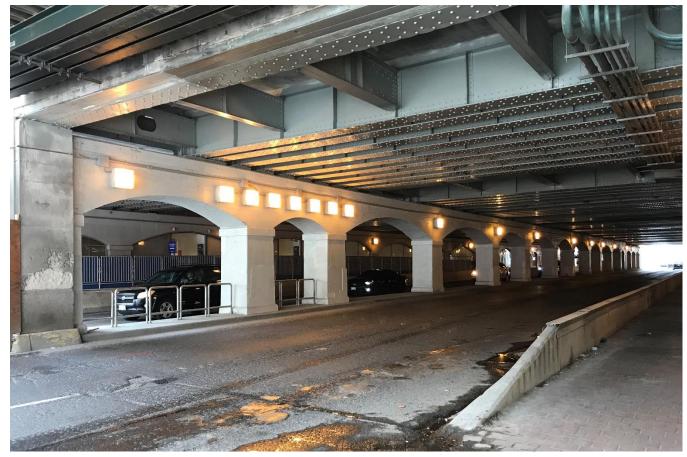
Centre set of columns that form the viaduct supporting the Union Station Trainshed. The columns and segmental arches are open, unlike the east and west sets of columns which are filled with glass panels
